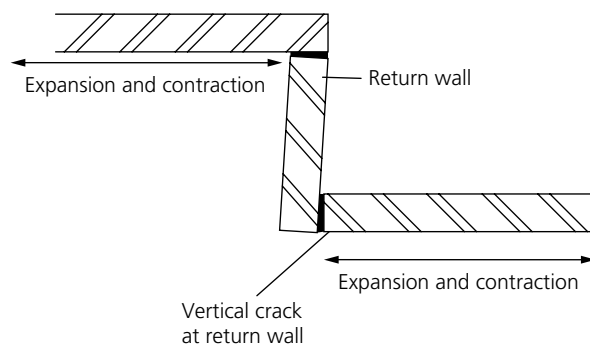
Cracking where return wall interrupts a longer run of wall
